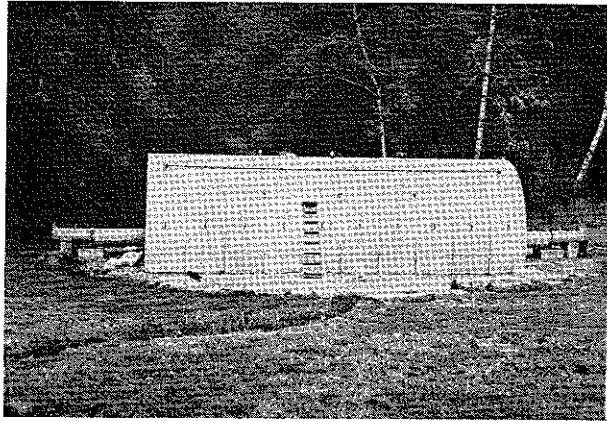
Test tunnel constructed for fire development studies in the Division of Building Construction, Royal Institute of Technology, Stockholm, Sweden. [12].
